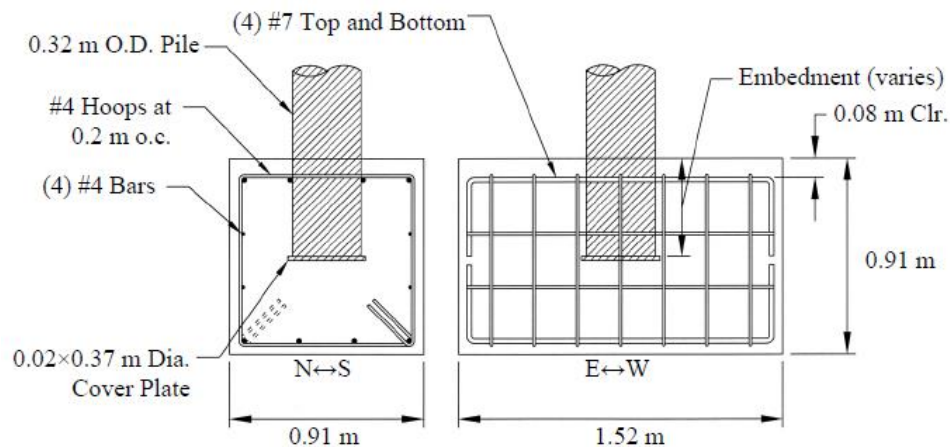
Typical Test Specimen Design (Eastman 2011)
